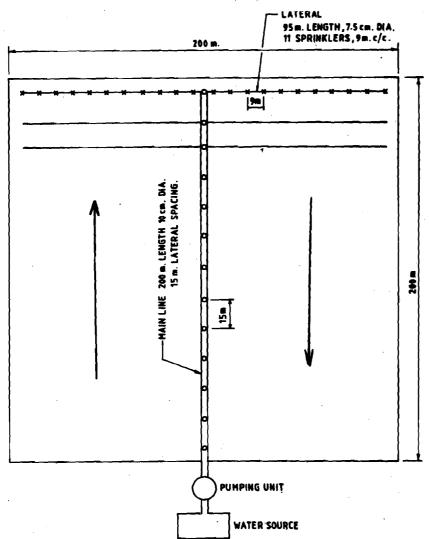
(a): Designed Layout of Sprinkler Irrigation System
